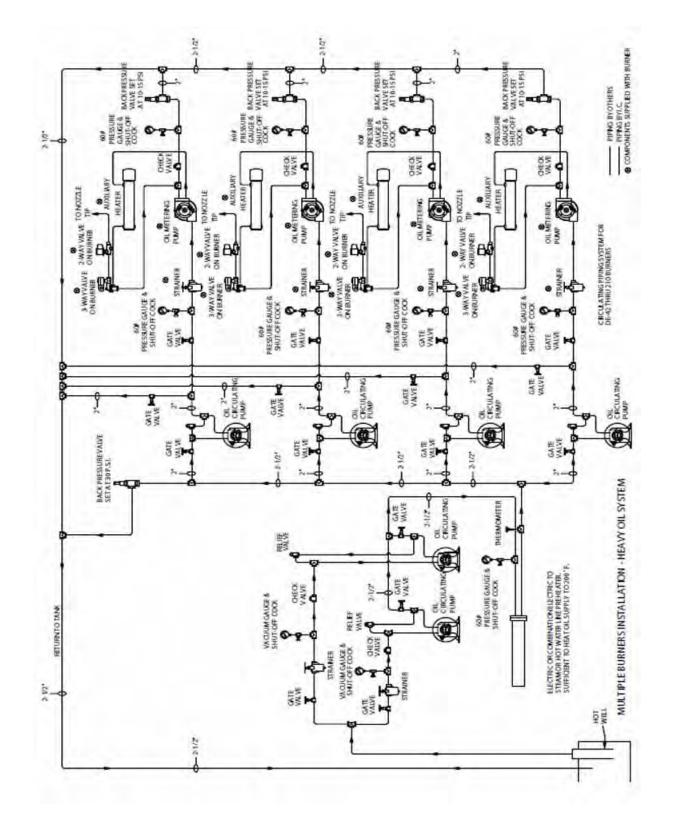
Multiple Boilers Installation-Heavy Oil
